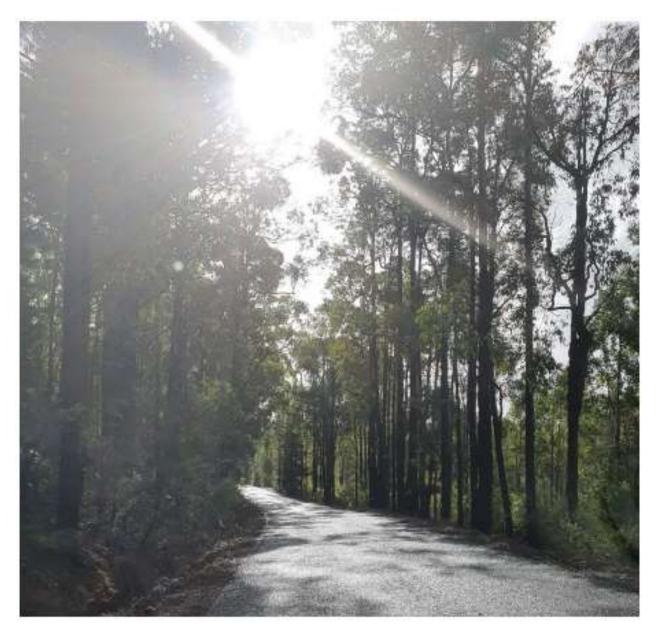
From the supporting document. The photograph shows a bend in the road which will require clearing on both sides to ensure sight lines to guideposts and advanced warning signs are suitable. A barrier is proposed to be installed on the southern side. The installation of barriers requires 1.6 meters to comply with the requirements of Austroads: Guide to Road Design Part 6 – Roadside Design Safety and Barriers (2010)
